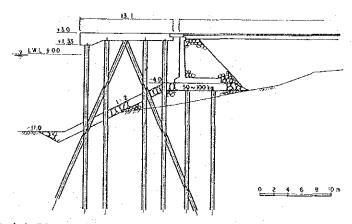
(2) Plan of Gravity Wall on Pile Type Structure
